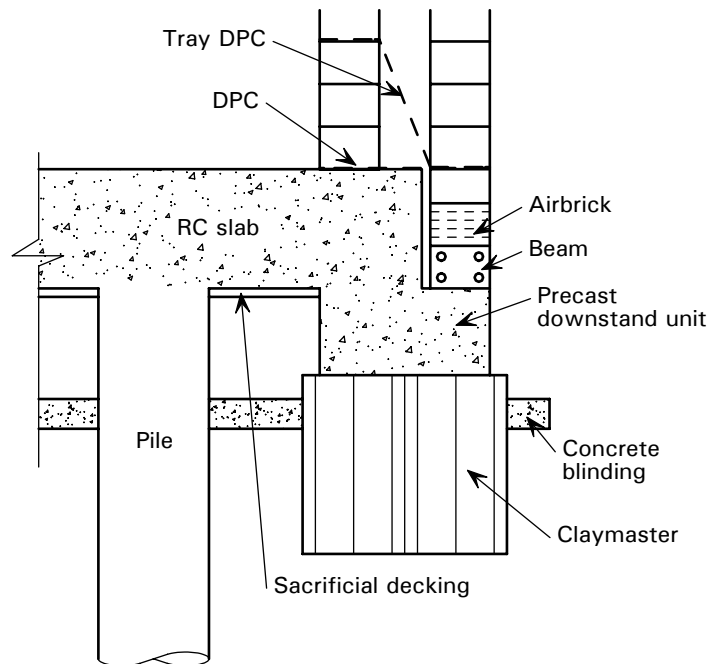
Housedeck® foundation system developed by Abbey Pynford PLC
